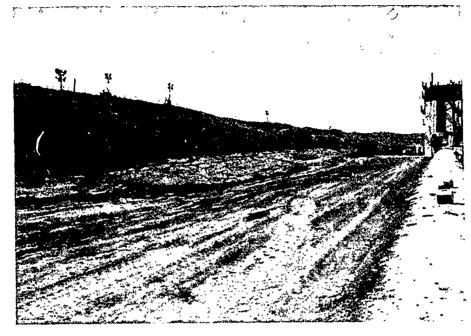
Outlet works, right side looking upstream. Cleaning shale surface in increments prior to placement of fill.
